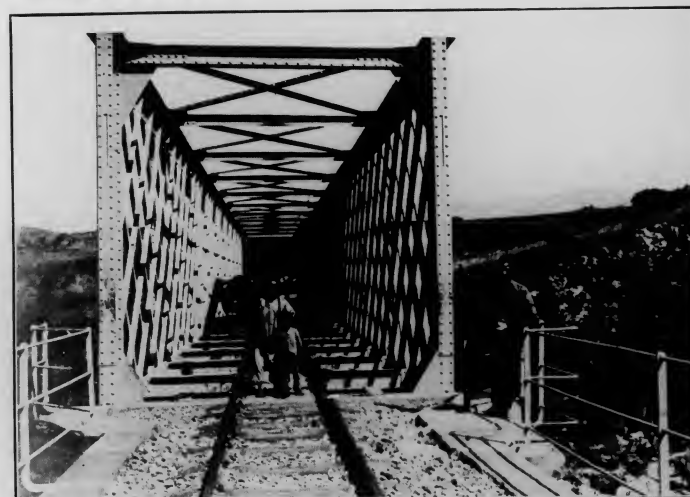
BRIDGE ON THE FRENCH YUNNAN RAILWAY, SHOWING STRINGER TRACK CONSTRUCTION.
